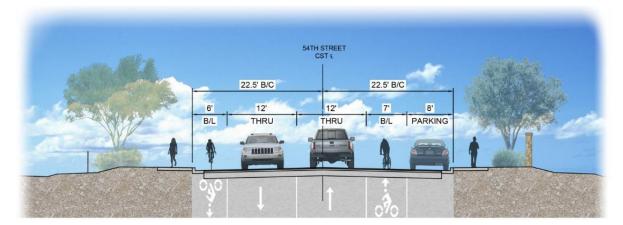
54th Street Typical Section - Segment H4 Standard Bike lanes/Parking East Side
